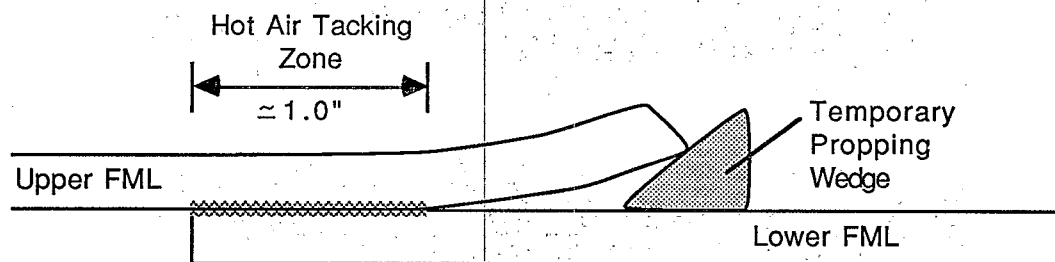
Smooth Propping Wedge Used When Tacking of Sheets is Done Before Surface Grinding of the FML Sheets
